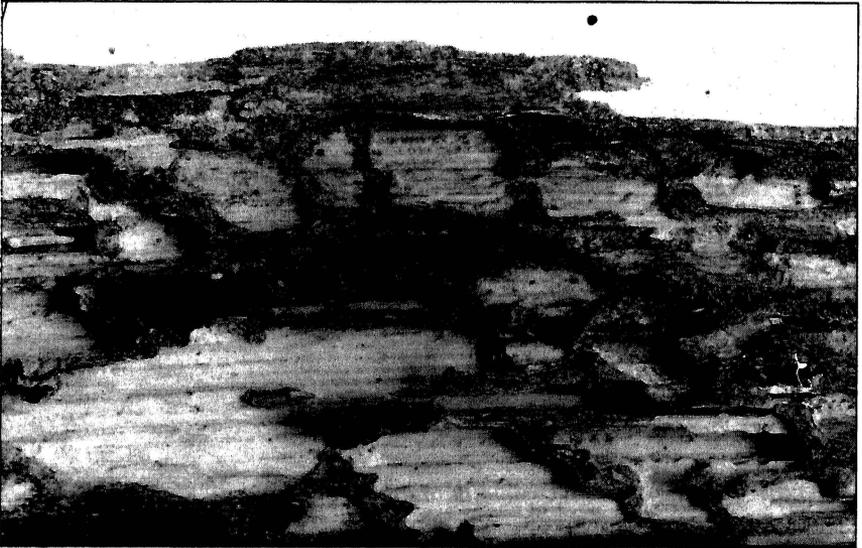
Typical work of termite on oak flooring. In time they will do serious damage to woodwork and the heavy timbers of buildings.
